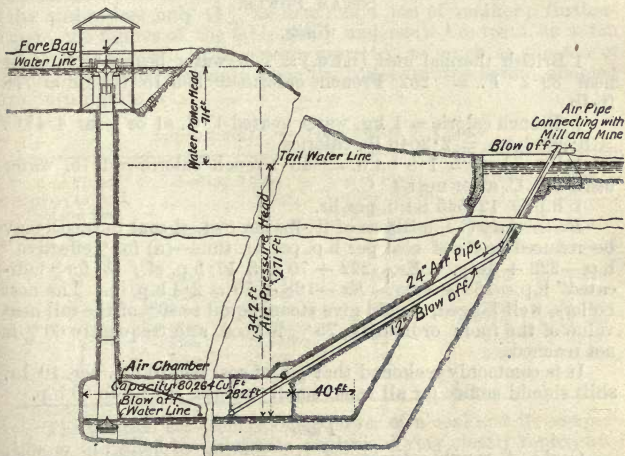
HYDRAULIC AIR COMPRESSOR, VICTORIA MINE, MICH.
